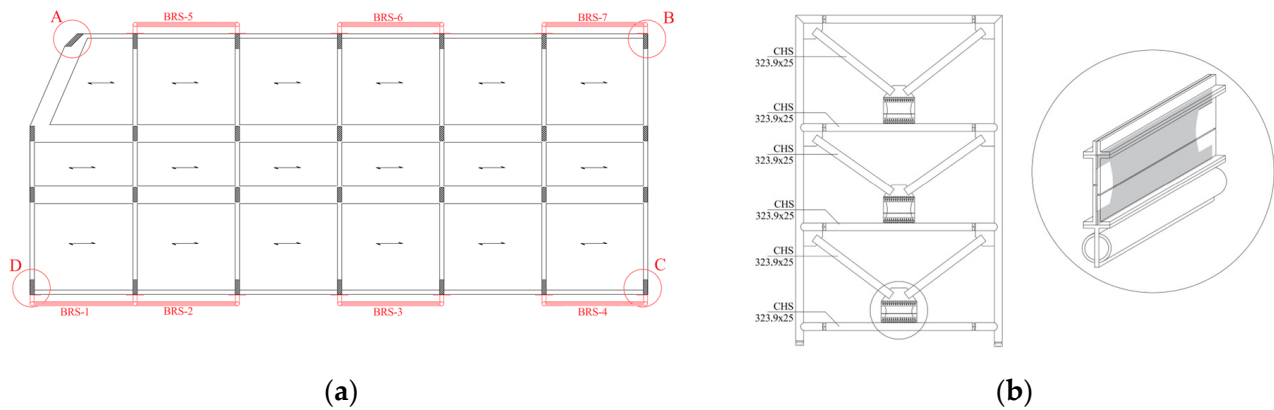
(a) Layout in plan of the retrofitted structure; (b) detail of a single-span BRS.
